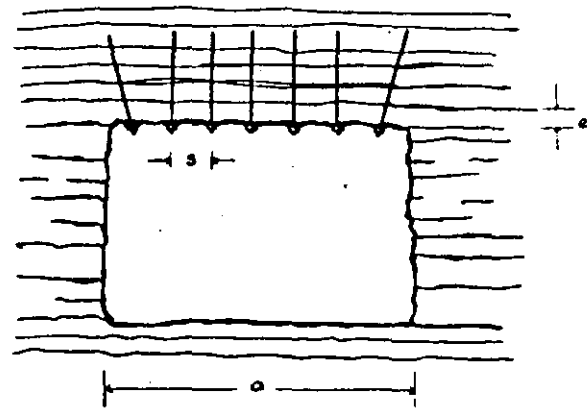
Reinforcement of a horizontally-bedded roof in weak rock to form a beam or slab.
